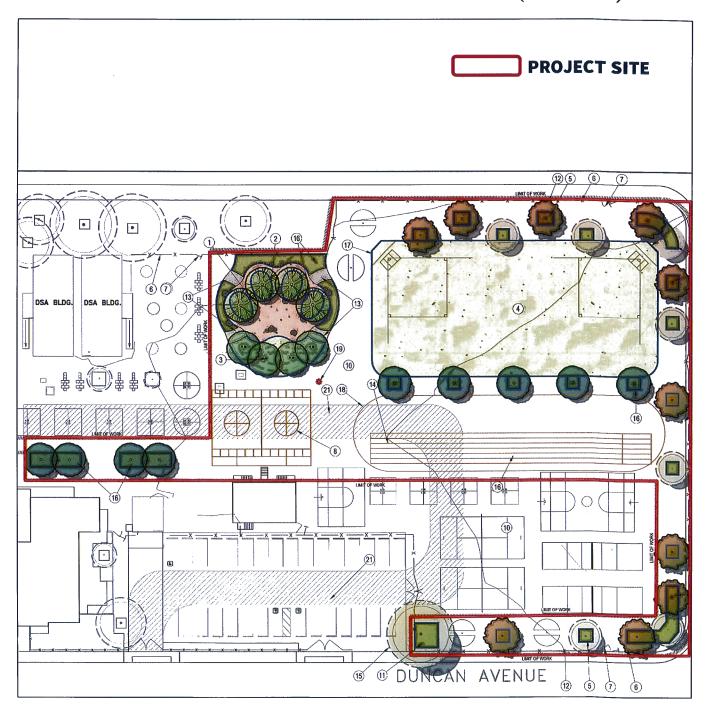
h STREET ES SITE PLAN (not to scale)
